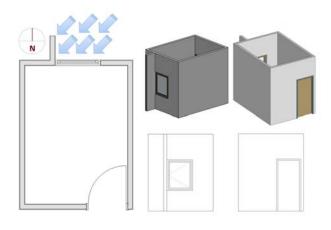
Bedroom unit floor plan with diagram of wind direction (NE to SW).
